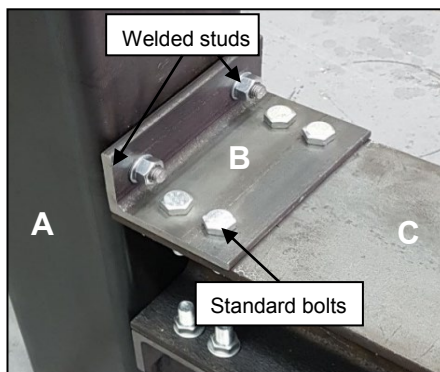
Example of the beam-to column joint assembled with threaded welded studs. A: hollow-section column. B: angle cleat. C: open-section beam.
